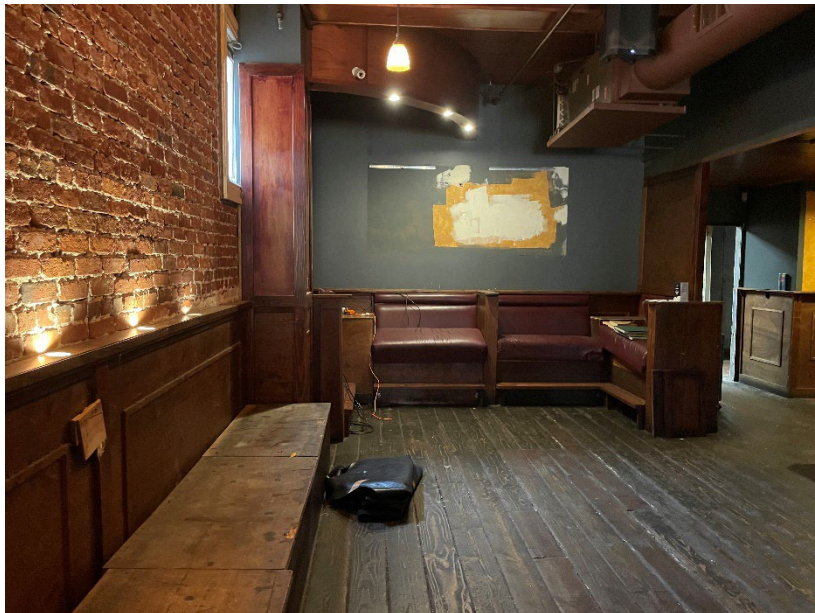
View of first floor, looking north along west wall. (Photo taken by P&T 03/14/2025)
